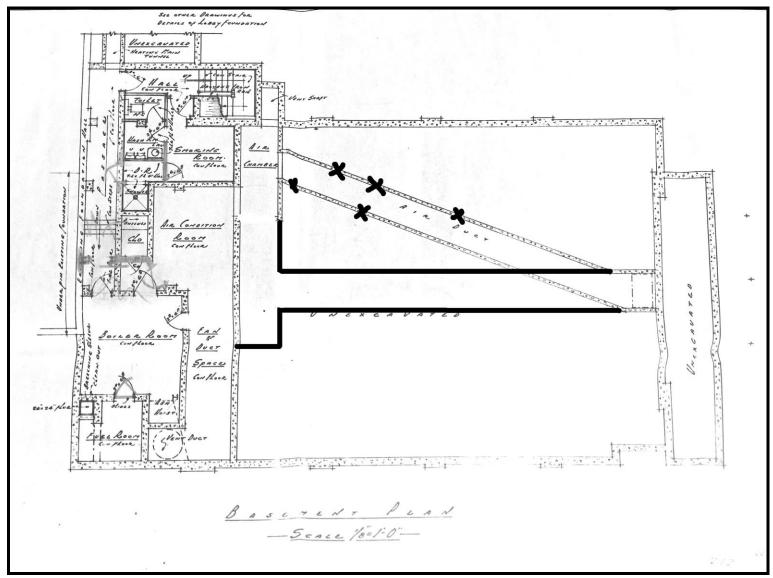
Basement Plan of 1014 King Street West, Hamilton – Westdale Theatre (Photo provided by City of Hamilton; Riddell 1935h)
